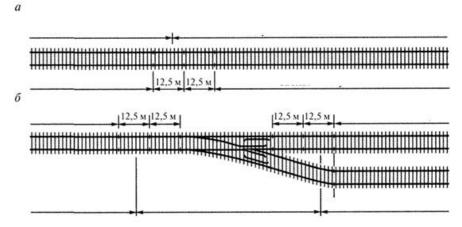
Schemes of adjoining the reinforced concrete sleeperless track on reinforced concrete sleepers to the link track (a) and to the switch (b)
